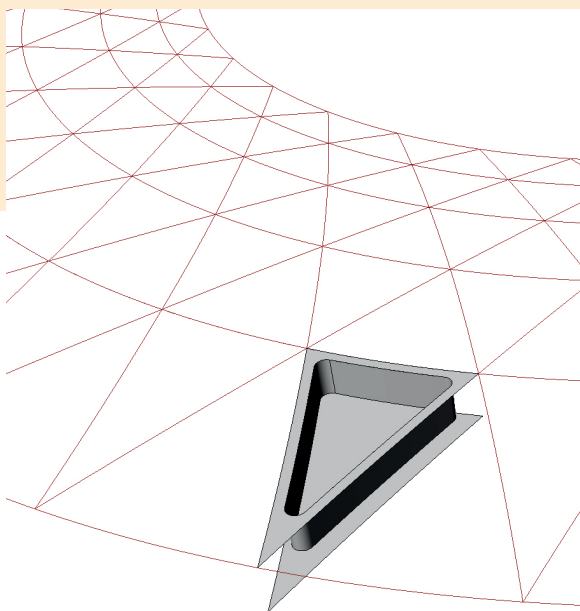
The base triangular module consists of a triangular surface and a poly-surface (Brep) obtained by welding the extrusion surface and the triangular cut surface.modules at the base of the construction of the final grid.
